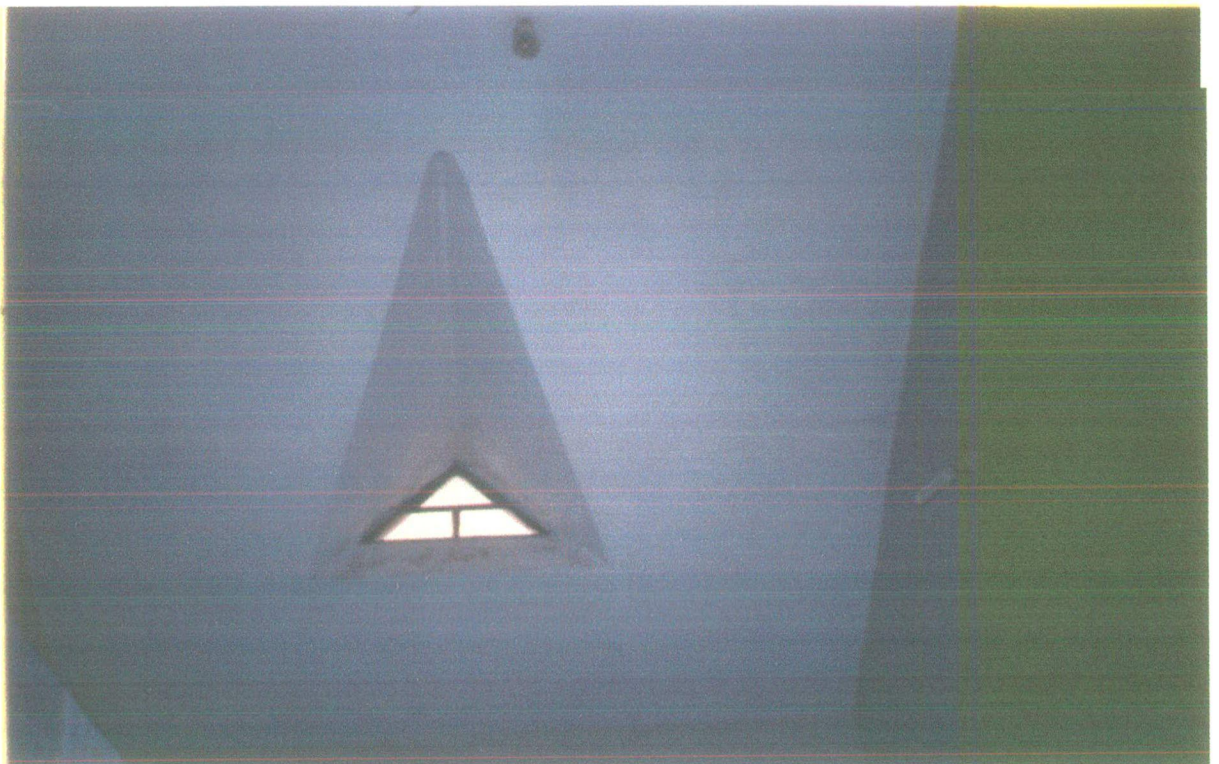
View of Dormer Window in R.C.C. Roof
